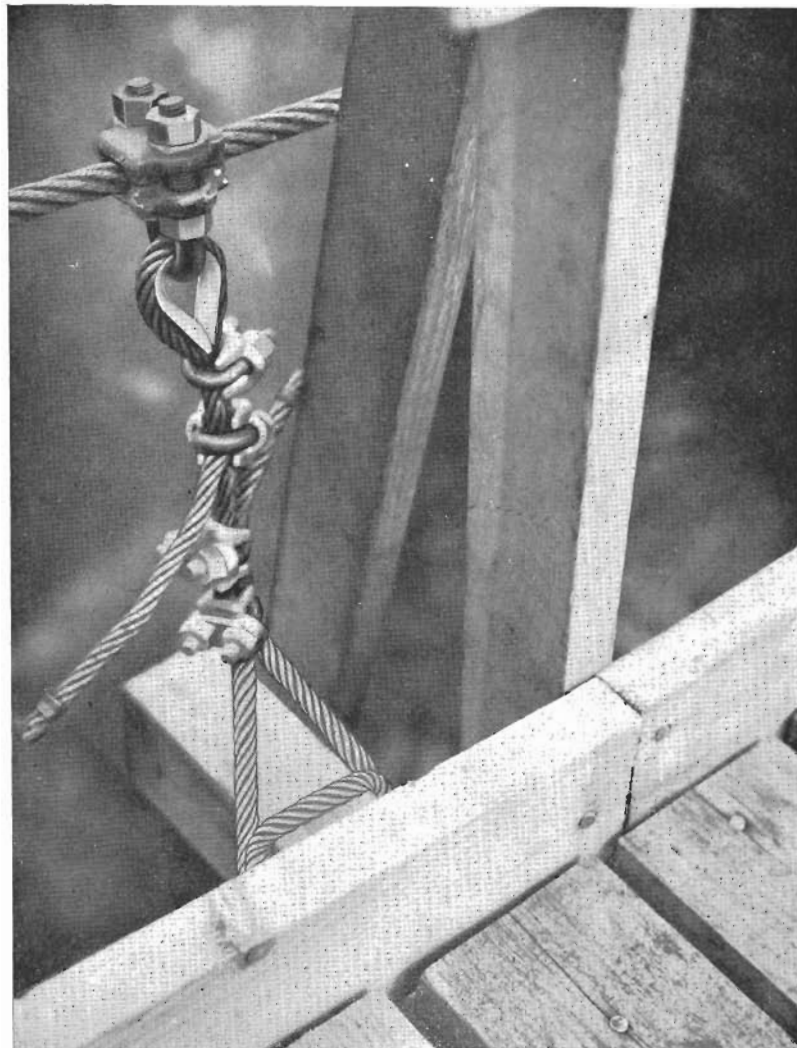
Suspender in place. Center suspender clipped in place. Note suspender is wrapped once around floor beam.
